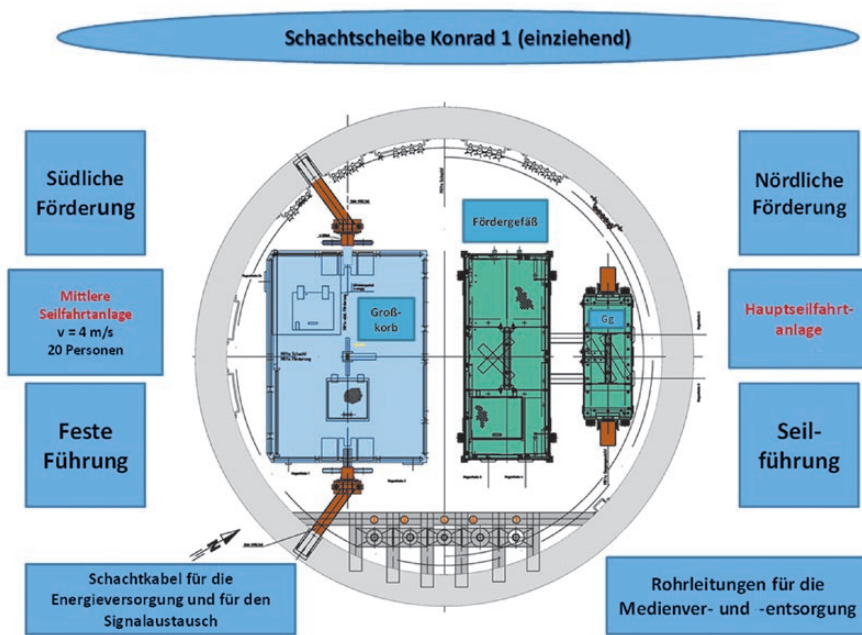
Shaft cross-section Konrad 1 shaft – final state.
